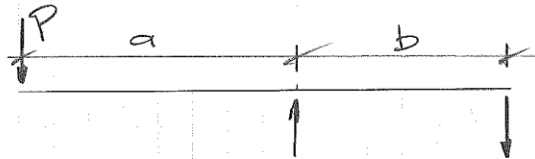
CANTILEVER W/ PT LOAD AT EXTREME END.
